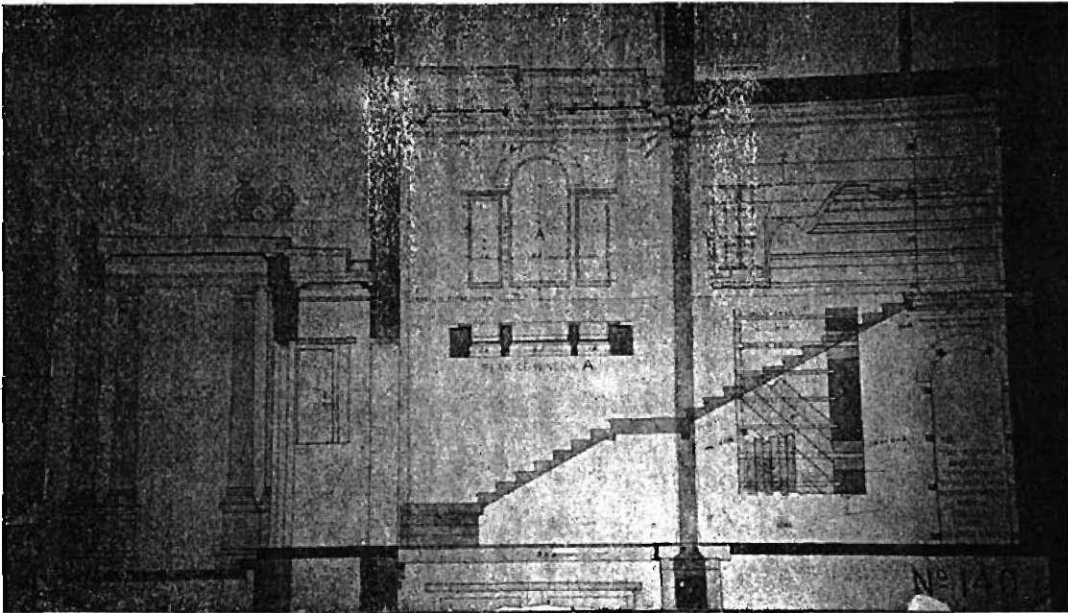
TOP Longitudinal section of New Hall, Eynsham Hall
